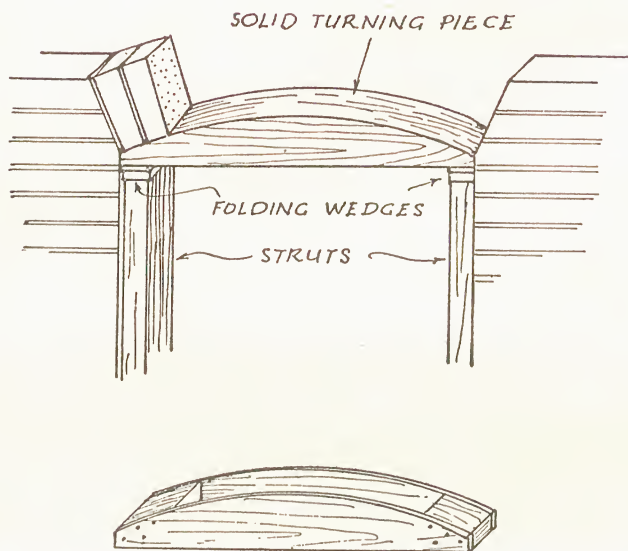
(Top) Solid turning piece on struts. (Bottom) Rib centre constructed of two shaped boards with spacing blocks.
